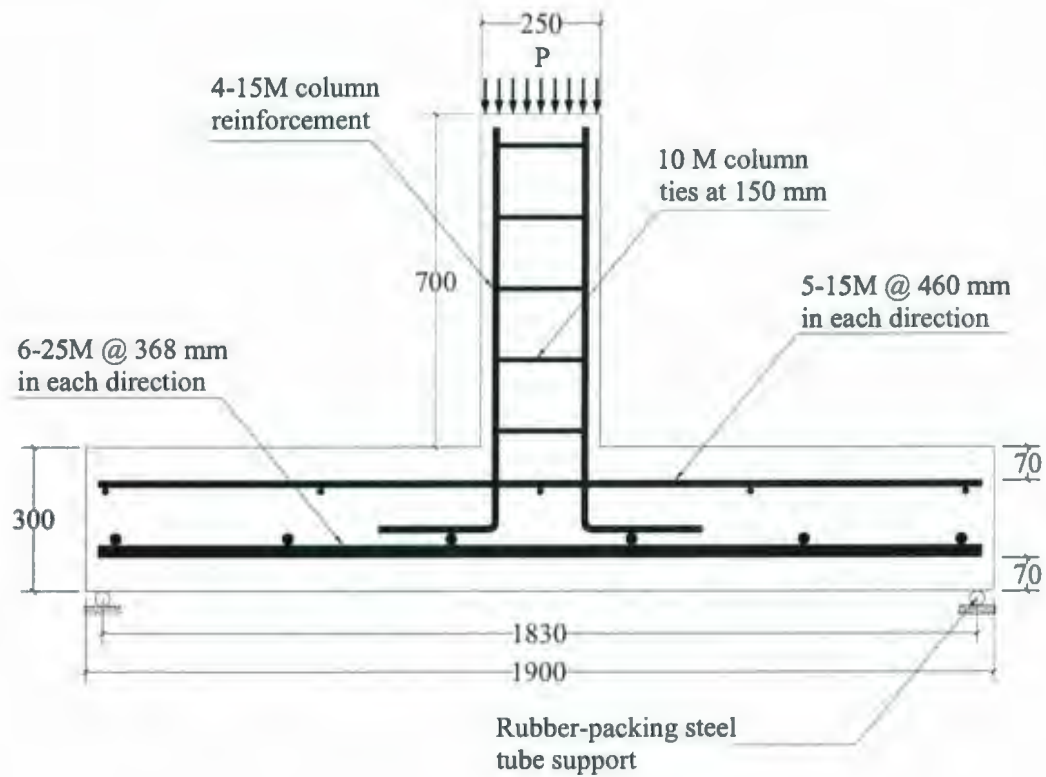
Details of typical test specimen HS2 ( $h = 300$  mm)
